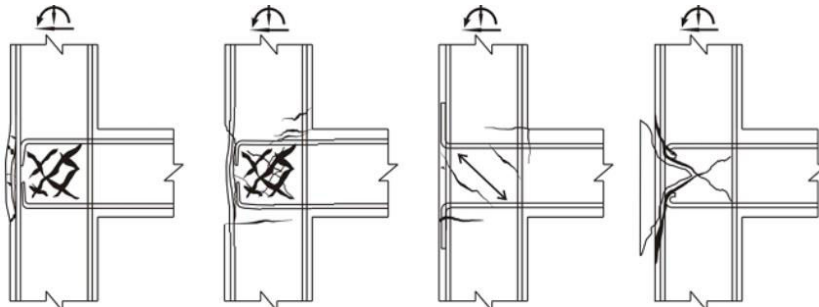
Failure mechanisms observed in the exterior BCJ's due to poor reinforcement detailing [16].
